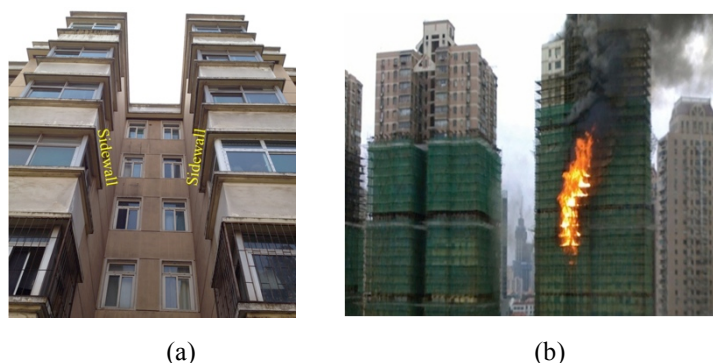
(a) U-shaped facade structure; (b) a facade fire in a tall building with a U-shaped facade structure.
